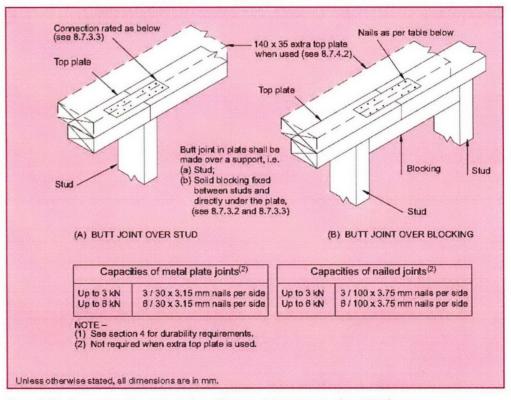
Connecting top plates in line - Walls containing bracing (see 8.7.3.3)
